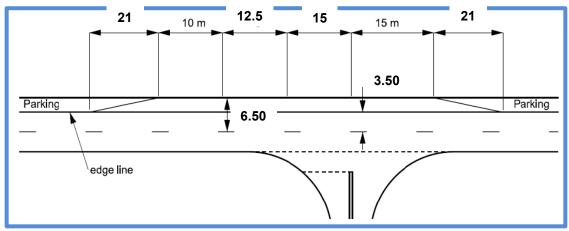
TYPICAL URBAN BAR / BAL INTERSECTION TREATMENTS (AUSTROADS) - ROAD No.1 INTERSECTION
